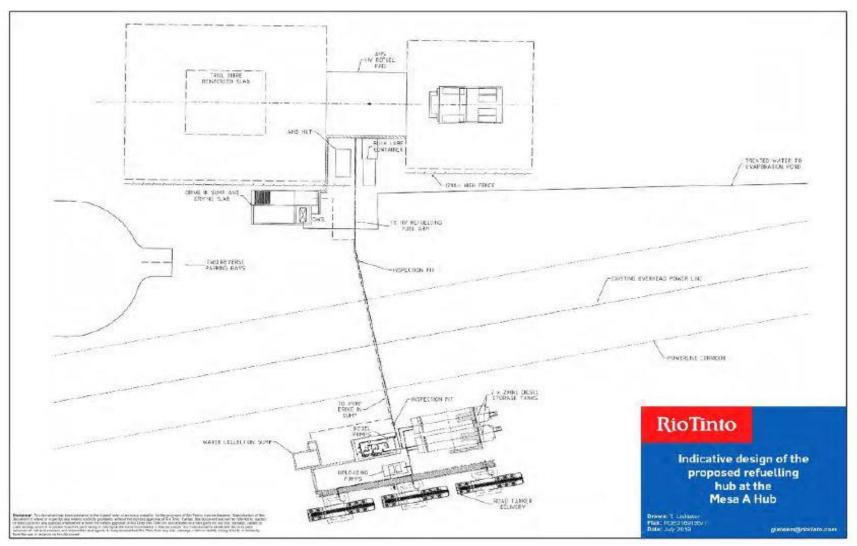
Design of the proposed heavy vehicle refueling facility at Mesa A/ Warramboo
